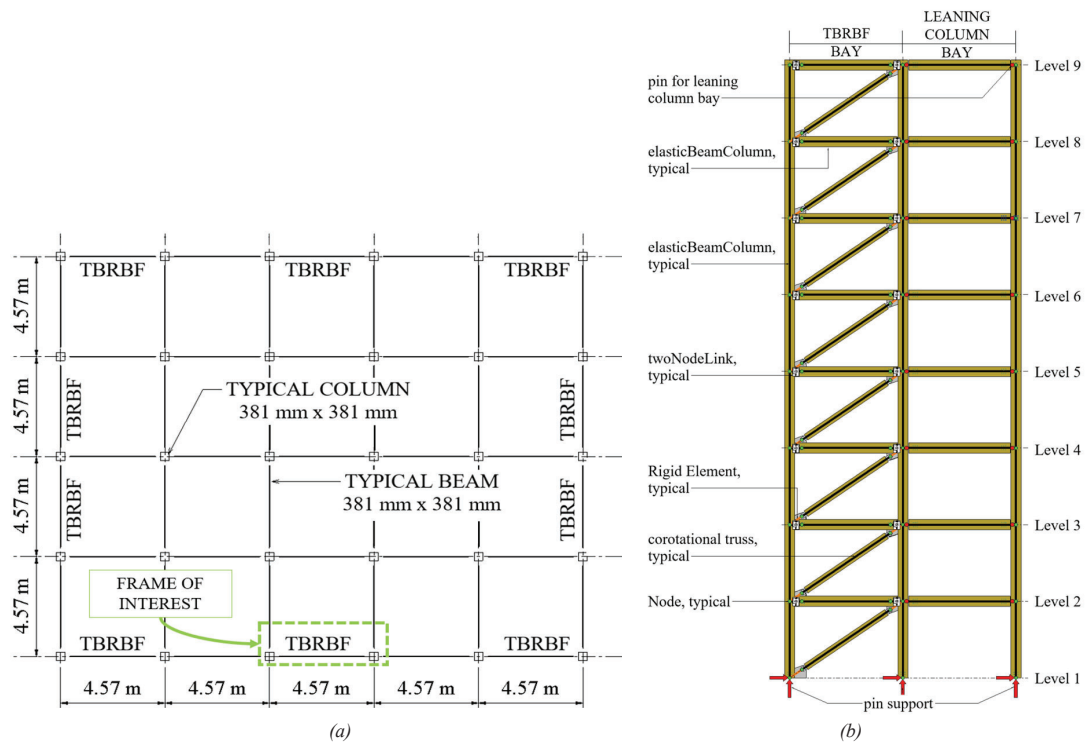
Eight-story building: (a) plan view of theoretical TBRB framed office building; (b) eight-story building TBRB framed model.
